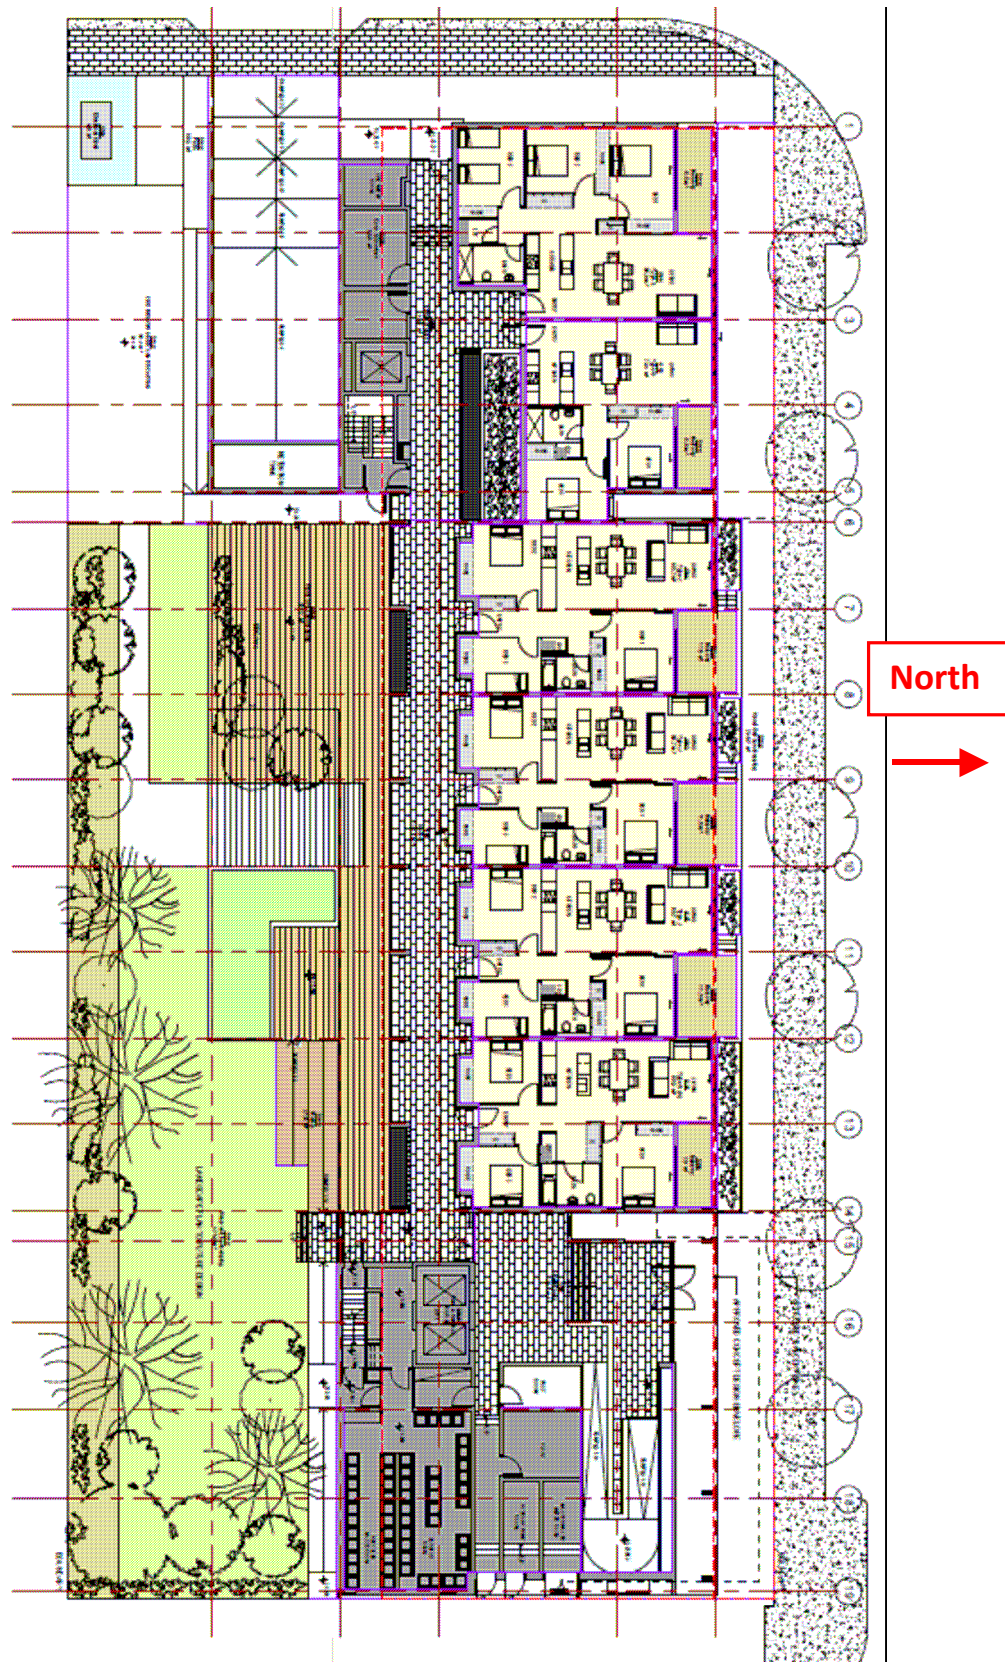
Ground floor plan of the proposed development at site D4 of the redevelopment (The plan is updated with wind tunnel test findings)
